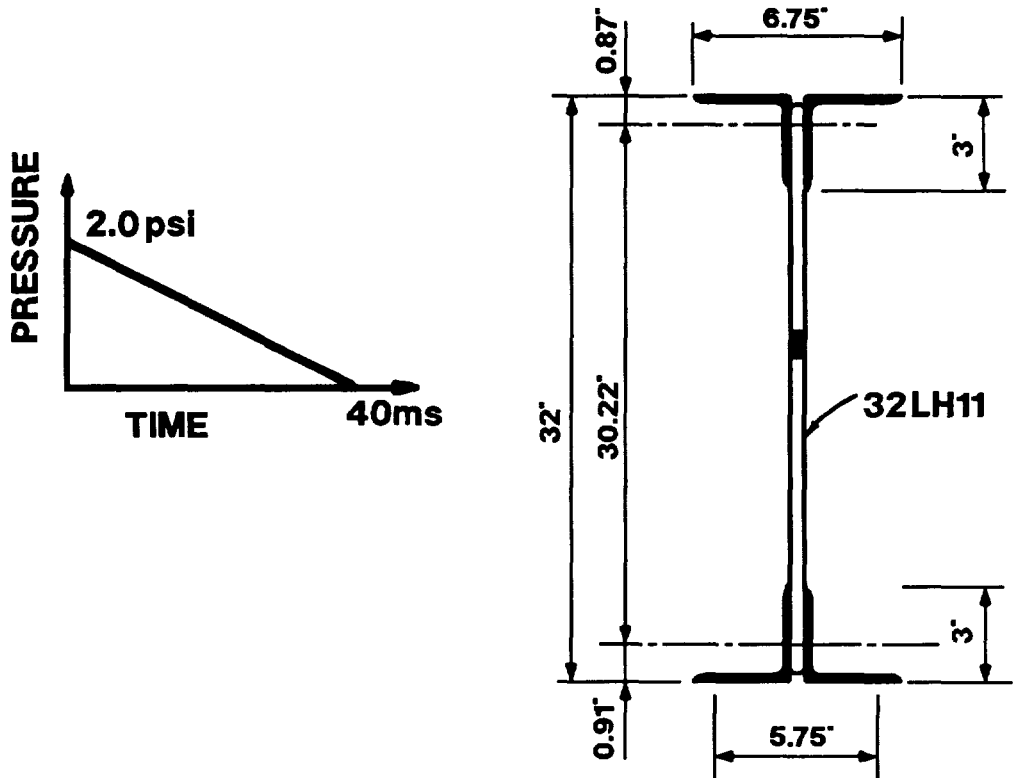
A-5(a) Joist cross-section and loading, Example 5A-5(a)
